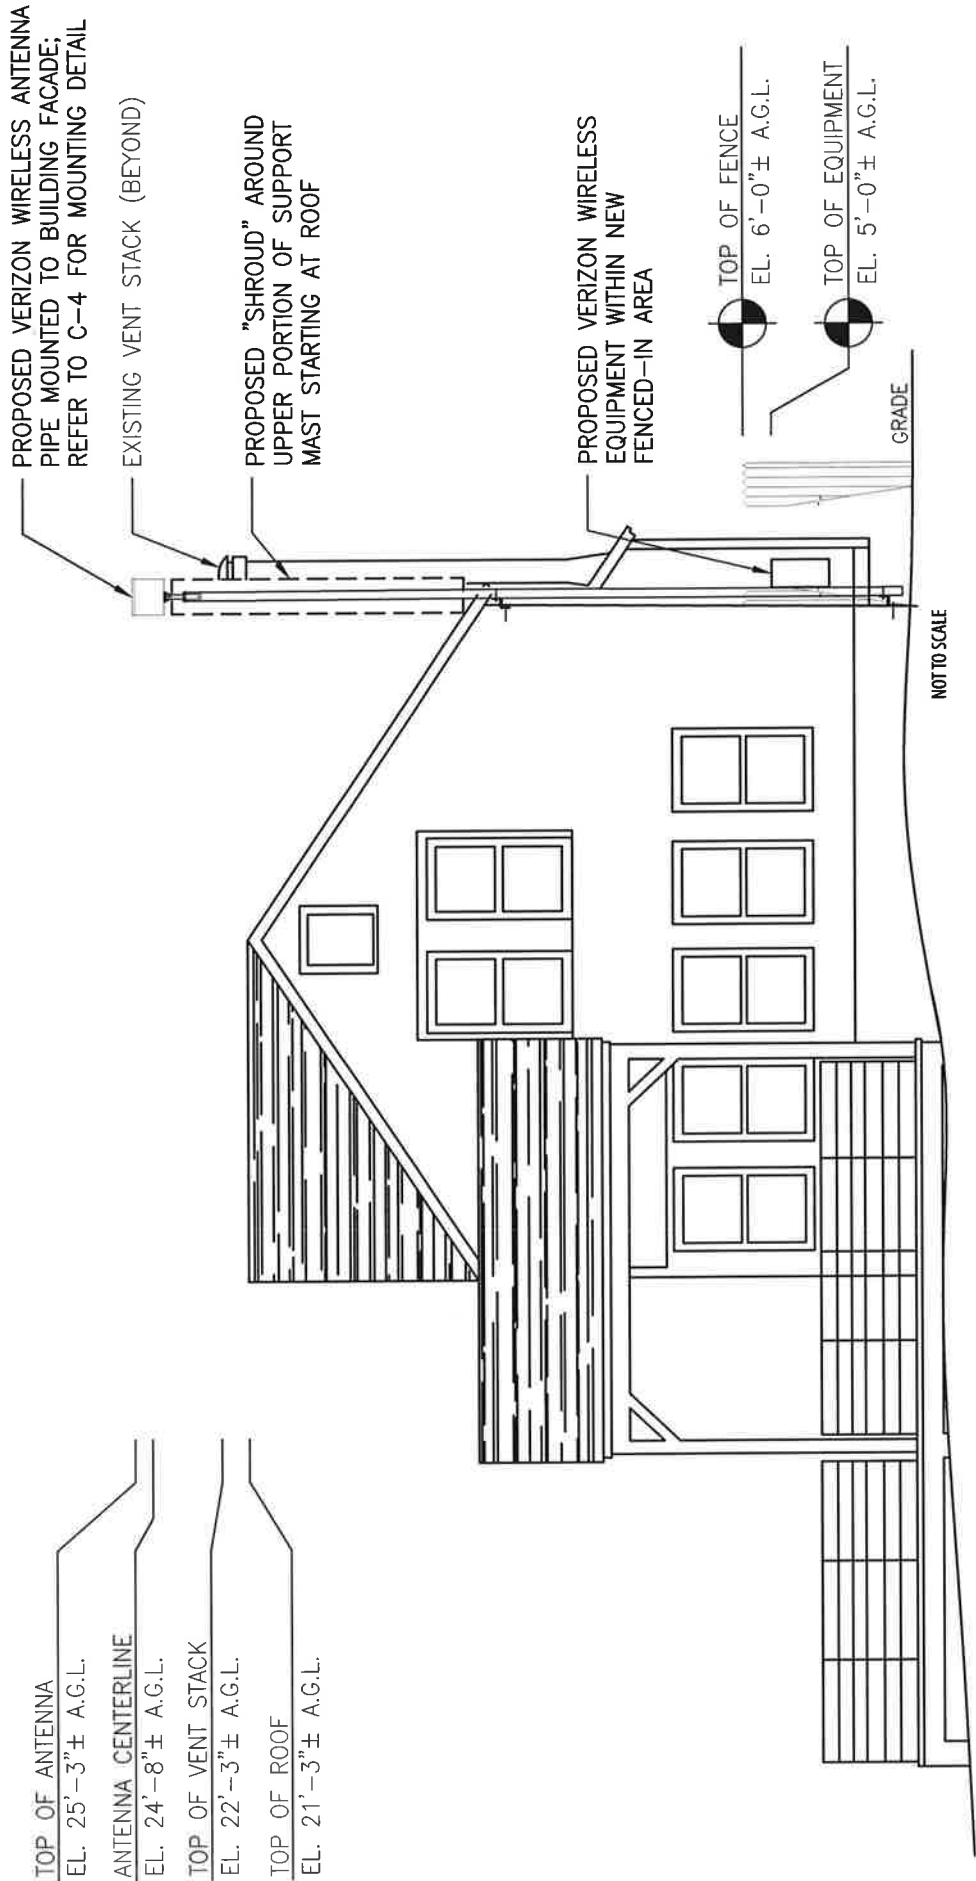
PROPOSED EQUIPMENT LOCATION AND ELEVATION PLAN FOR ANTENNA SC-1 CT
